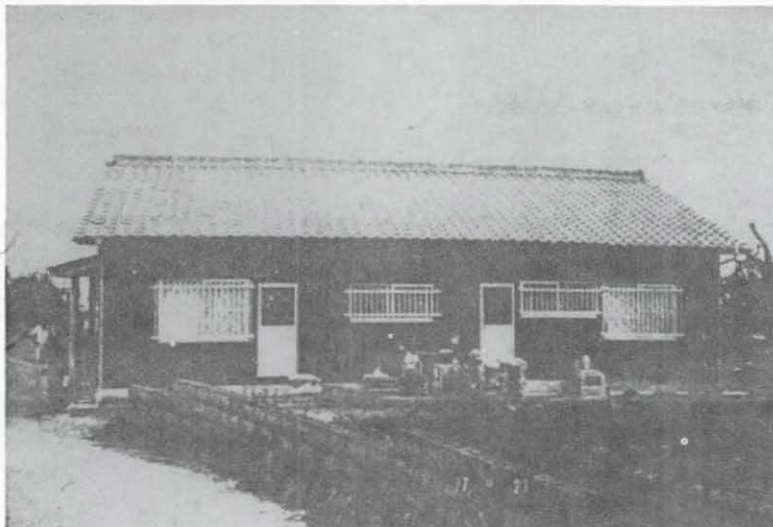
GRILLS ON EXTERIOR WALL OPENINGS
